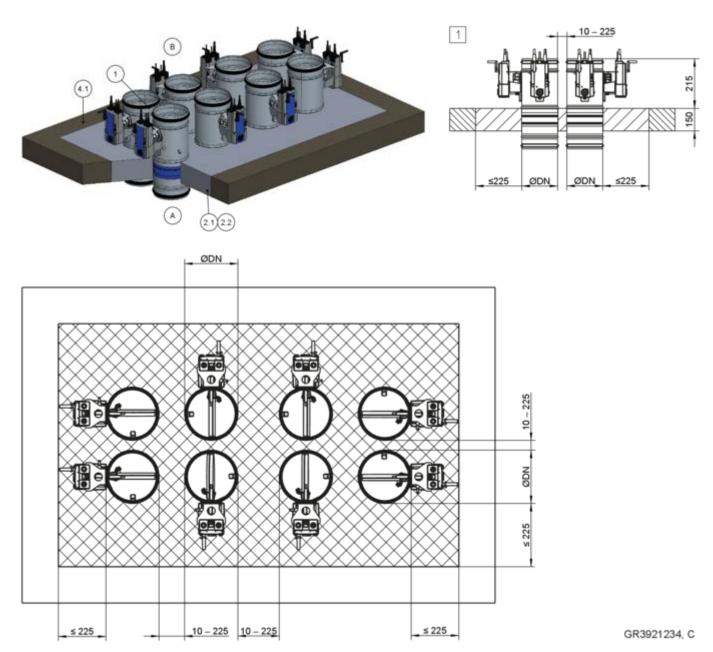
Mortar-based installation – multiple installation into one installation opening, illustration shows upright installation (applies also to suspended installation)
